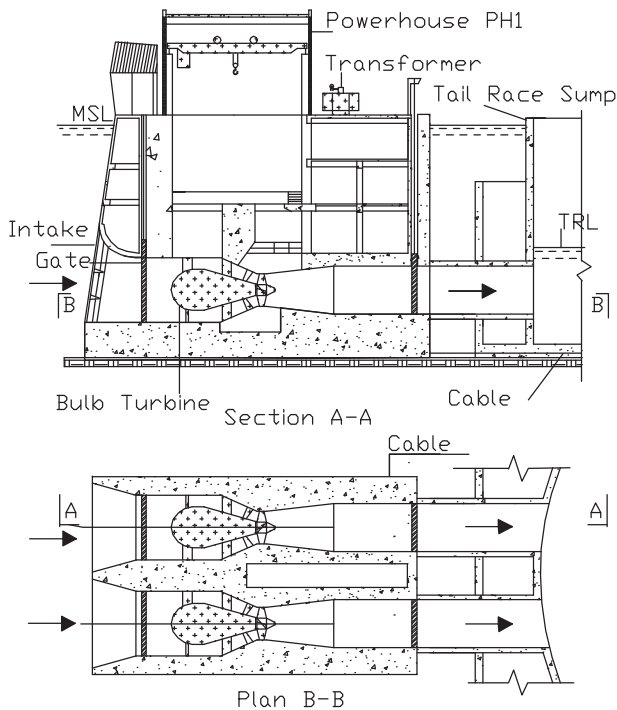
G.A. plan and cross-section of Powerhouse PH1.
